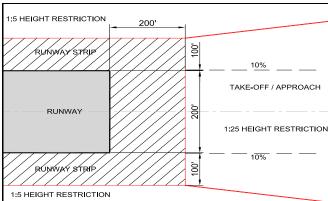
Plan View of Building Restrictions Adjacent to Airports
